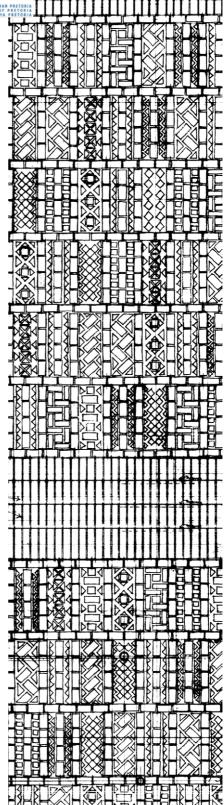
Right - 'Brick Floor "Carpets" & Pavings Etc.' (Eaton, N. 1961)
